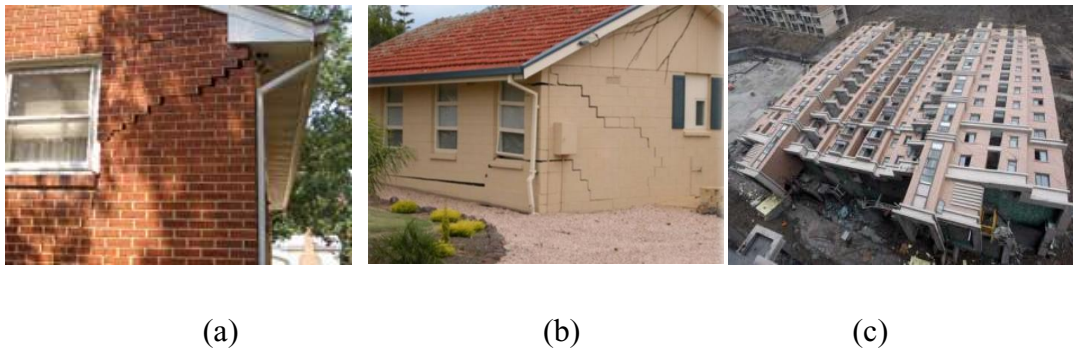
Impact of differential settlement on structure: (a) Failure of wall and façade (<https://www.omnibasementsystems.com/foundation-repair/foundation-warning-signs.html>); (b) Failure of wall and windows; (c) Failure of a building (Song, 2010)
